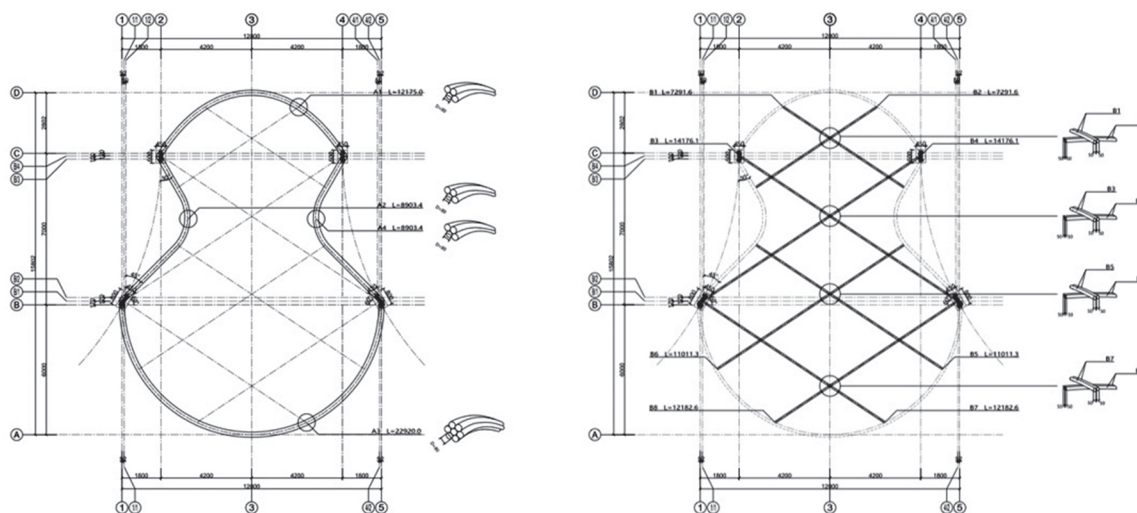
a) Plan showing the four arches, with sections through the bamboo beams; b) Plan showing the structural members, with sections indicating the joinery system.
